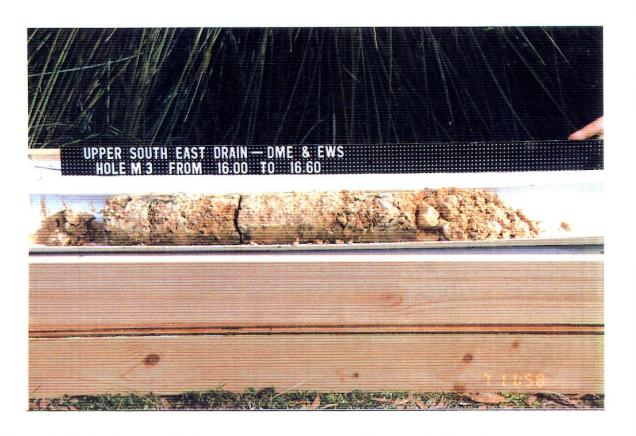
SITE 1, Borehole M3. Core sample from 16.00 m to 16.60 m depth
